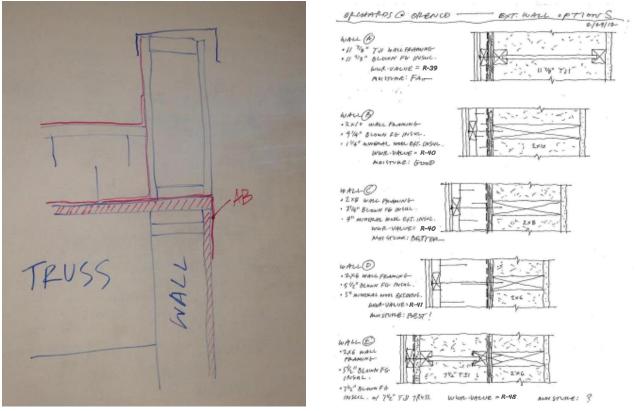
Concept detail developed at kickoff charrette to address need for air barrier continuity at the critical wall to roof joint.
